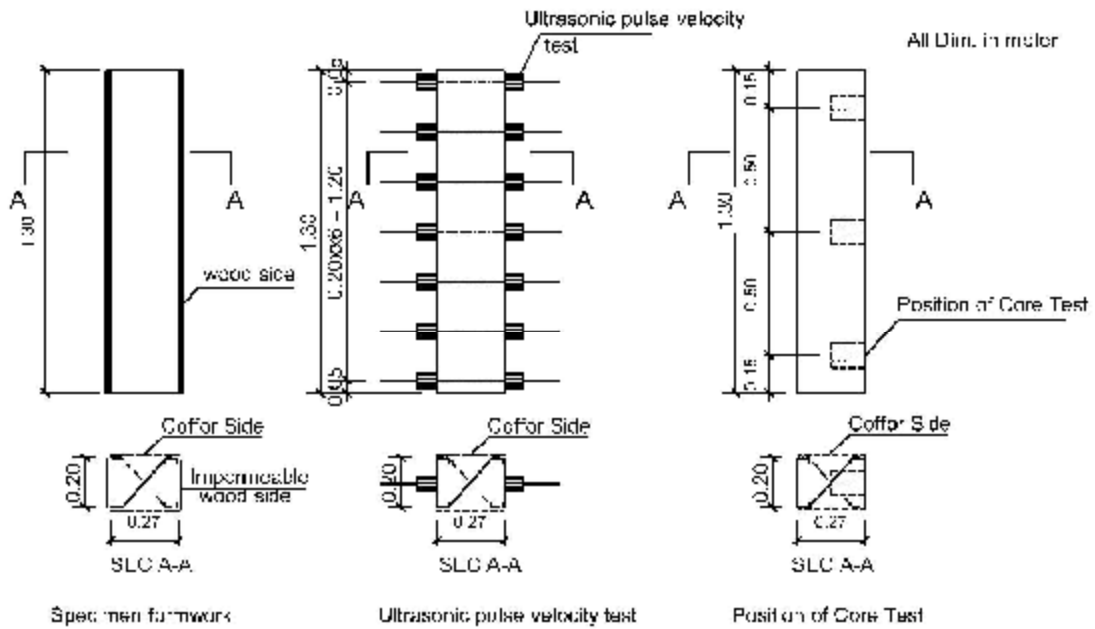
Details and Tests of Typical Specimen of Group (A)
